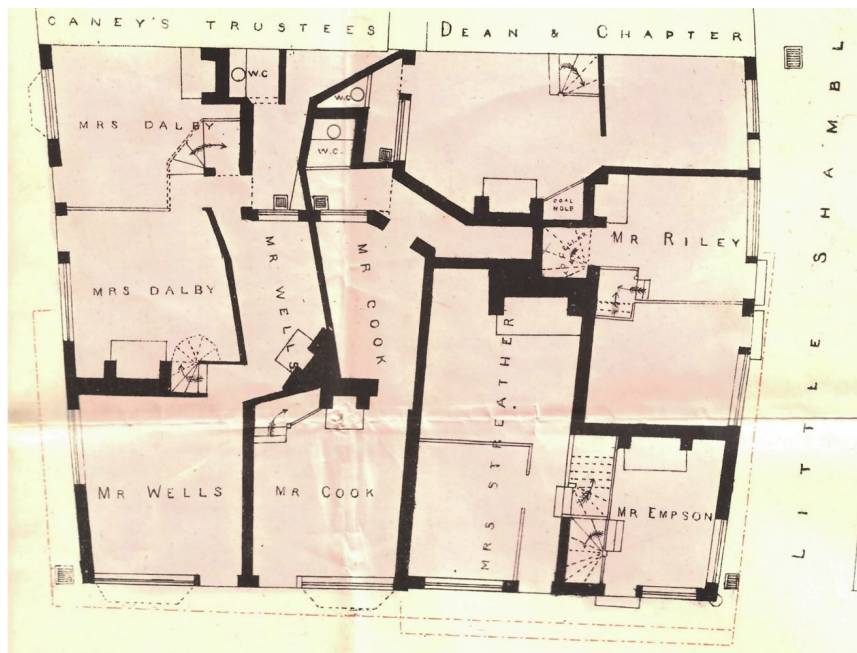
Ground Floor plan contained in the 1885 sales leaflet, showing the complexity of the internal plan and occupancy.
